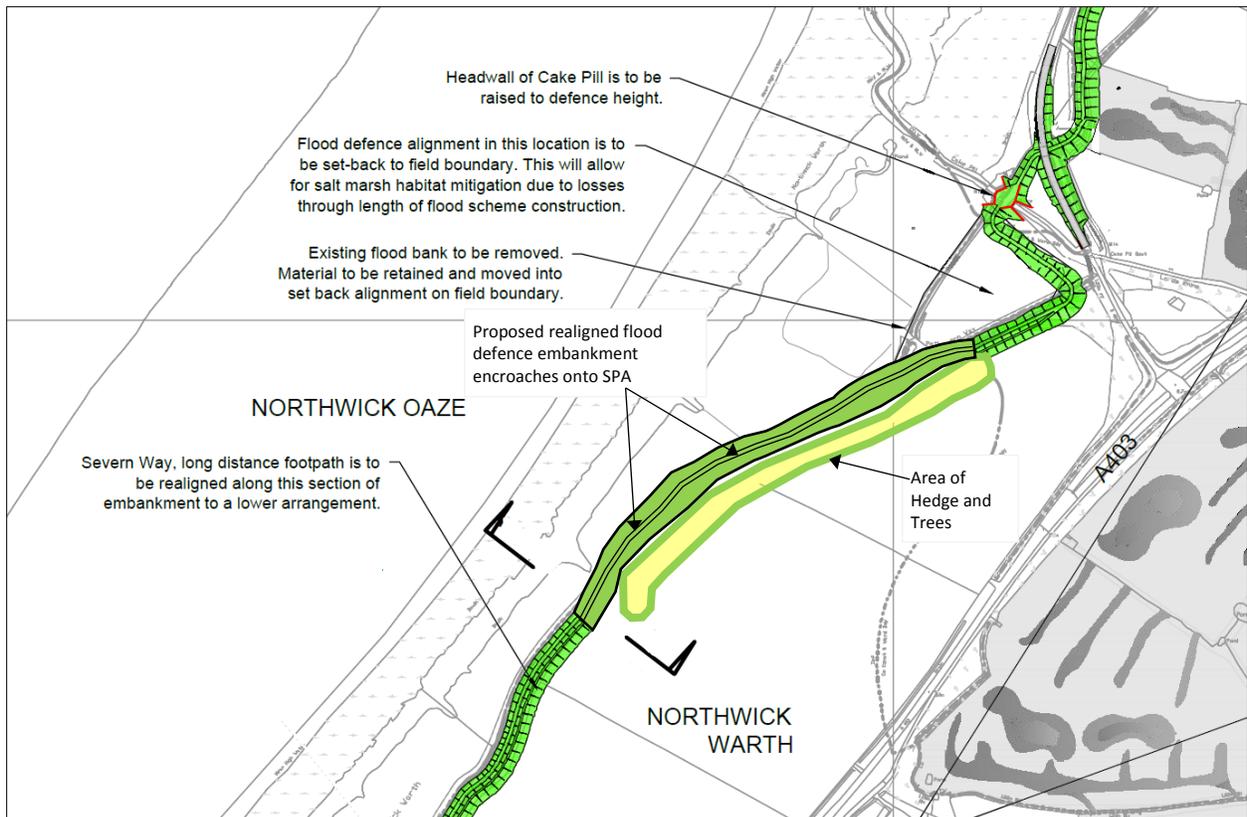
Plan of Alternative Flood Defence Embankment Encroaching into SPA
